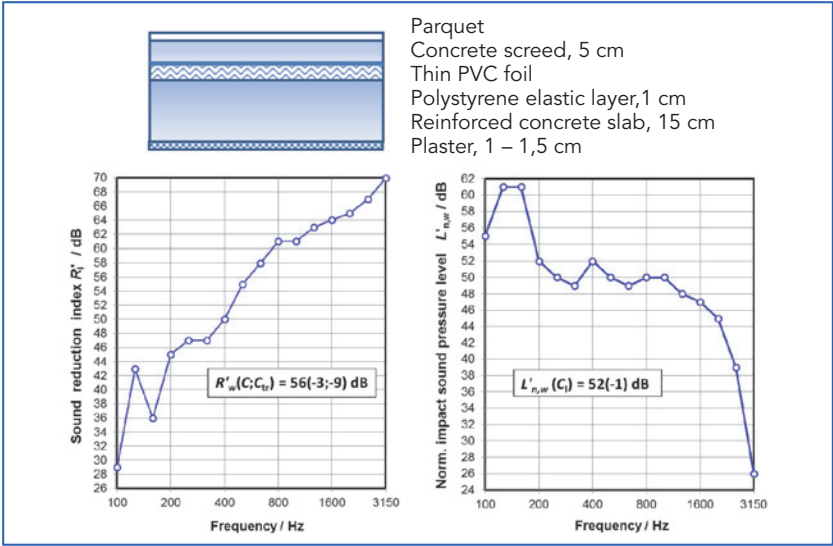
Case study: sound insulation performance of typical floor construction with reinforced concrete slab.
